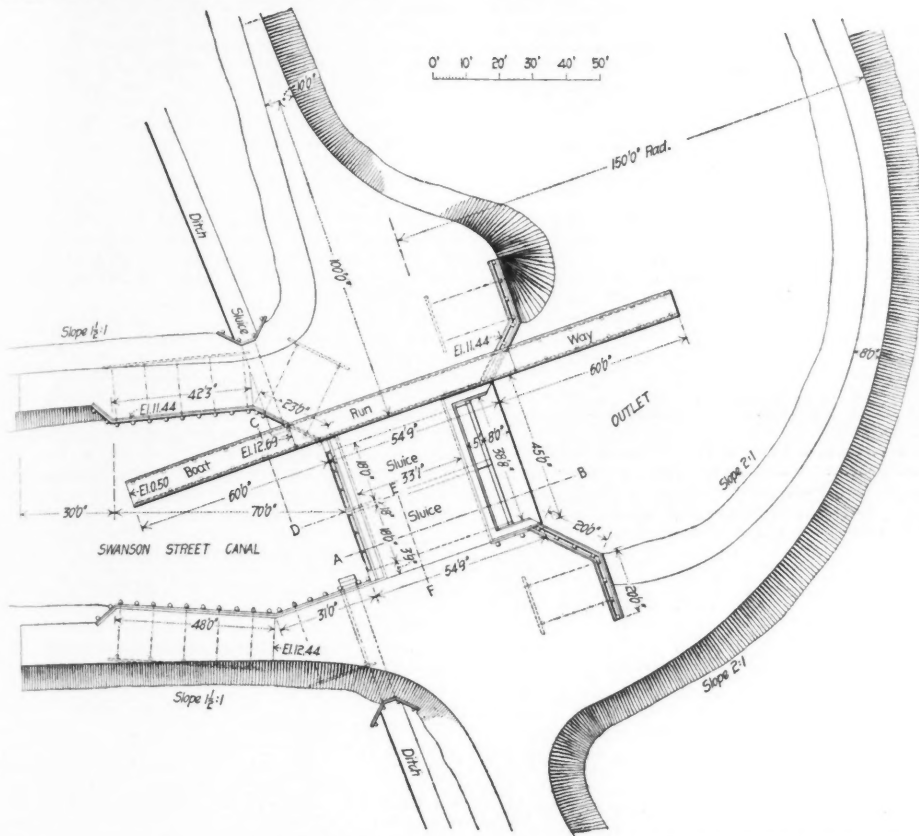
PLAN OF SWANSON ST. CANAL OUTLET, PHILADELPHIA, PA, SHOWING LOCATION OF TWIN TIDE GATE.
